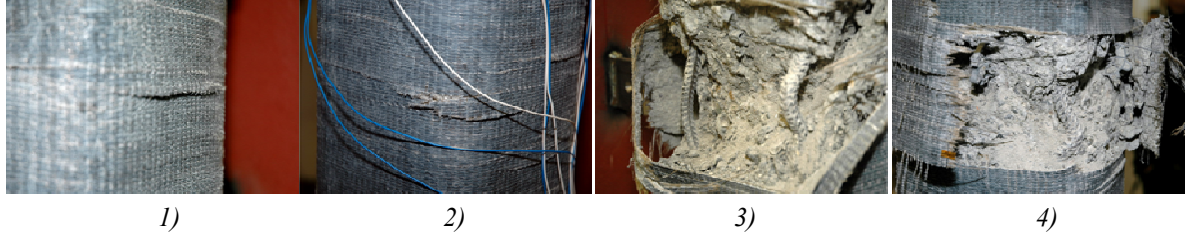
Failure close ups: 1) Horizontal crack in BFRP jacket during loading, 2) BFRP jacket started to rupture, 3) buckling of longitudinal bars, 4) BFRP jacket rupture and buckling of longitudinal bars.
